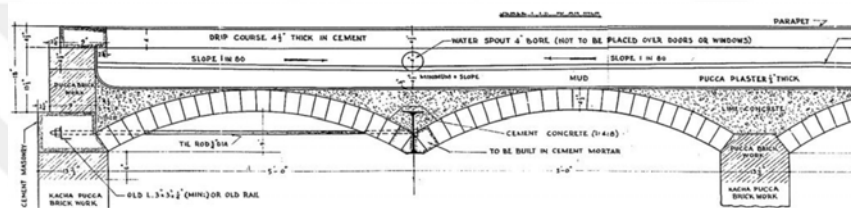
Jack Arch Roofing System used in India during the Colonial Era
